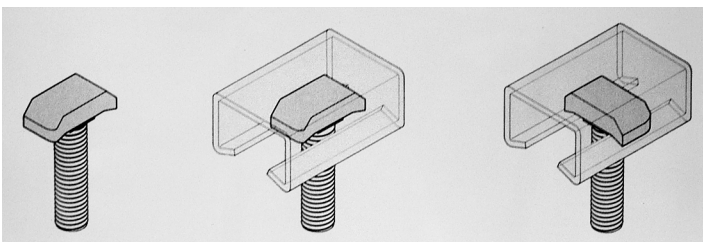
Installing a T-head bolt in a cast-in-place channel
